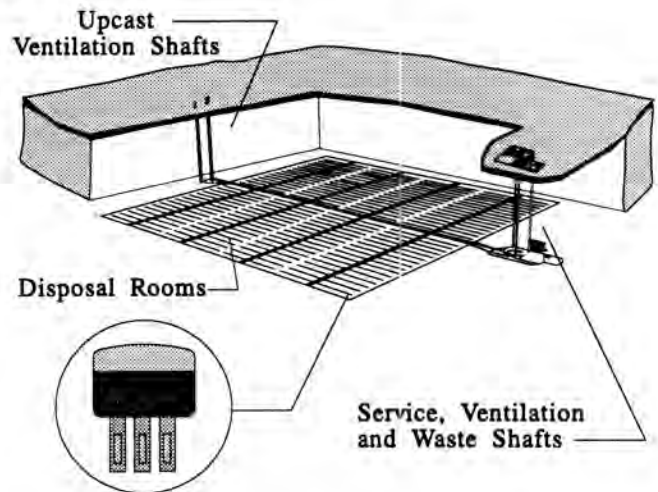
Disposal center with a single-level disposal vault using in-floor borehole emplacement.
